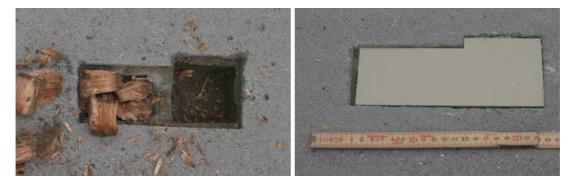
Box out in bridge deck where the sensor and battery box are installed and a protection lid is added on top. Right: Ready for applying the waterproofing membrane
